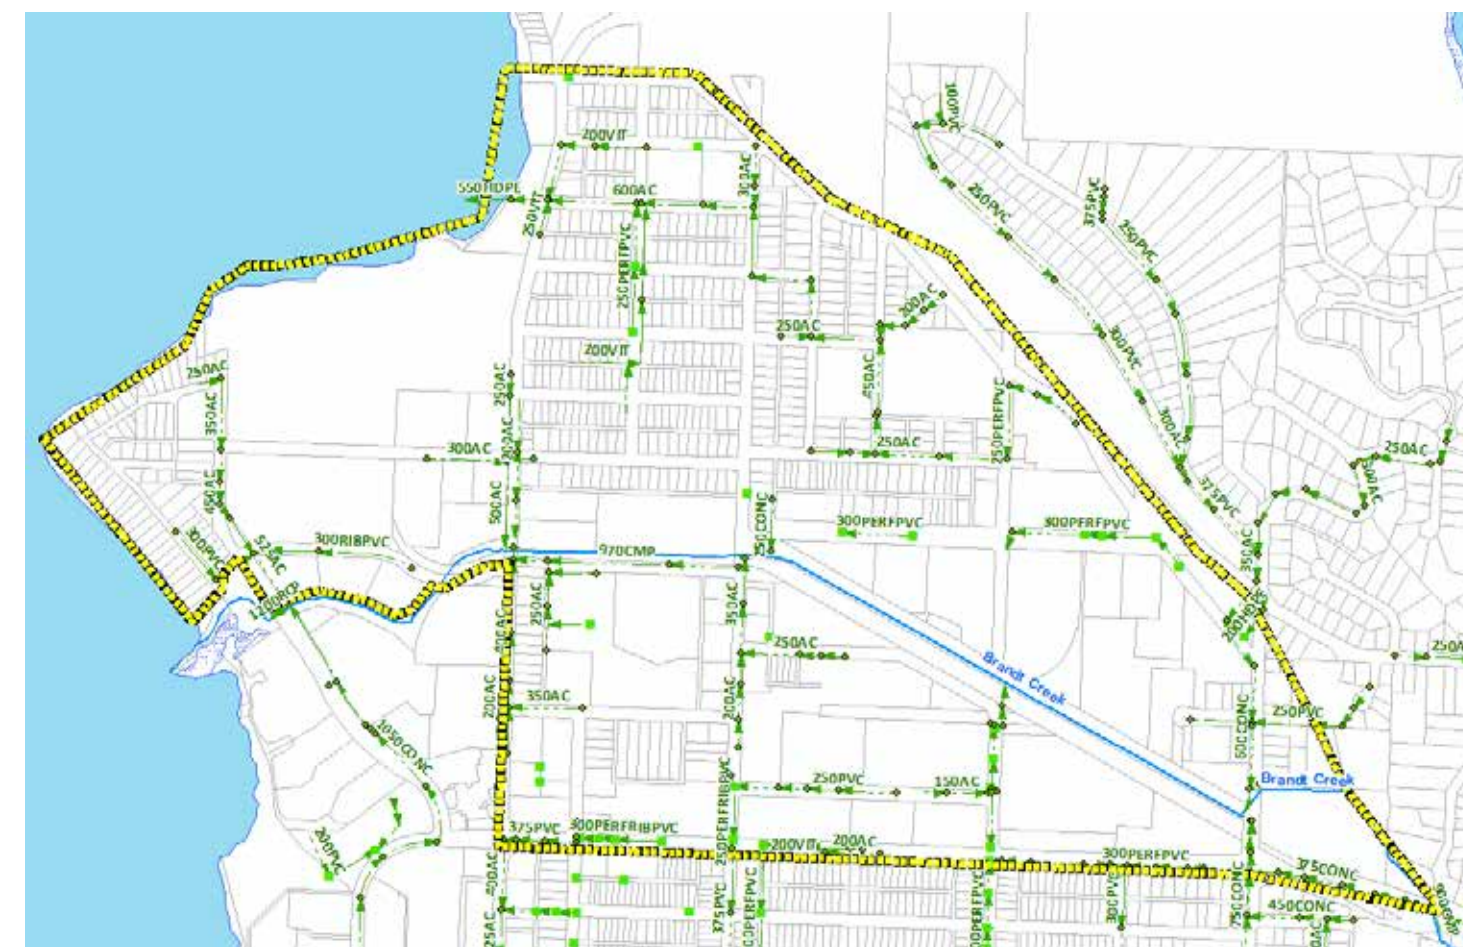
North End Existing Stormwater Sewer Collection System by Age
